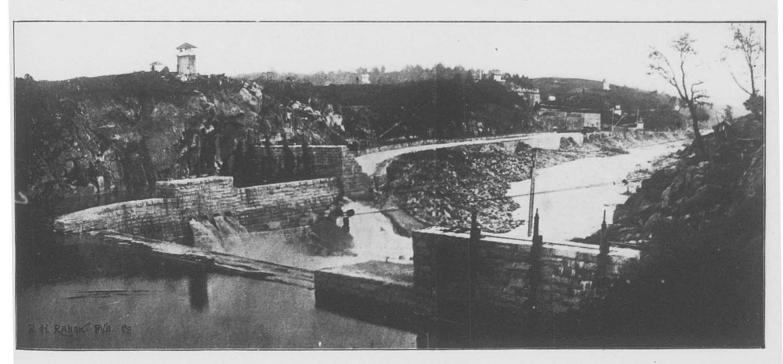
THE DAM AND HEAD WORKS OF THE FOLSON WATER POWER COMPANY, SHOWING SECTION 1 OF THE EAST CANAL.;
